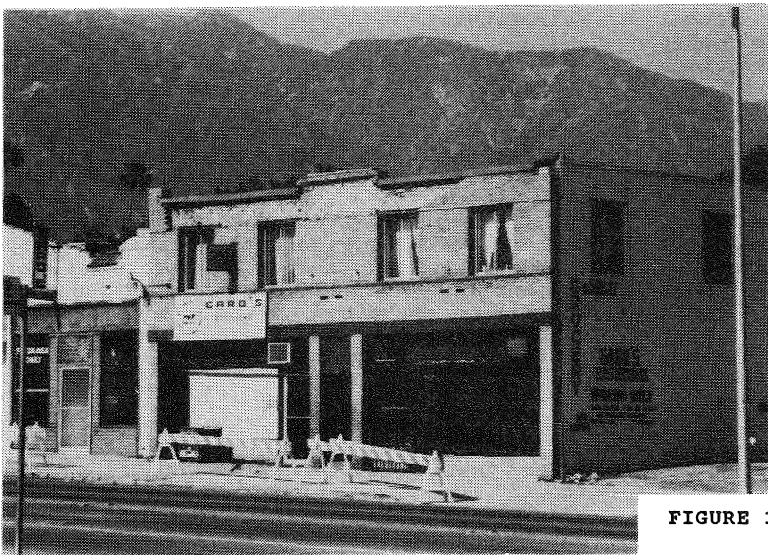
BUILDING DIRECTLY ACROSS STREET
